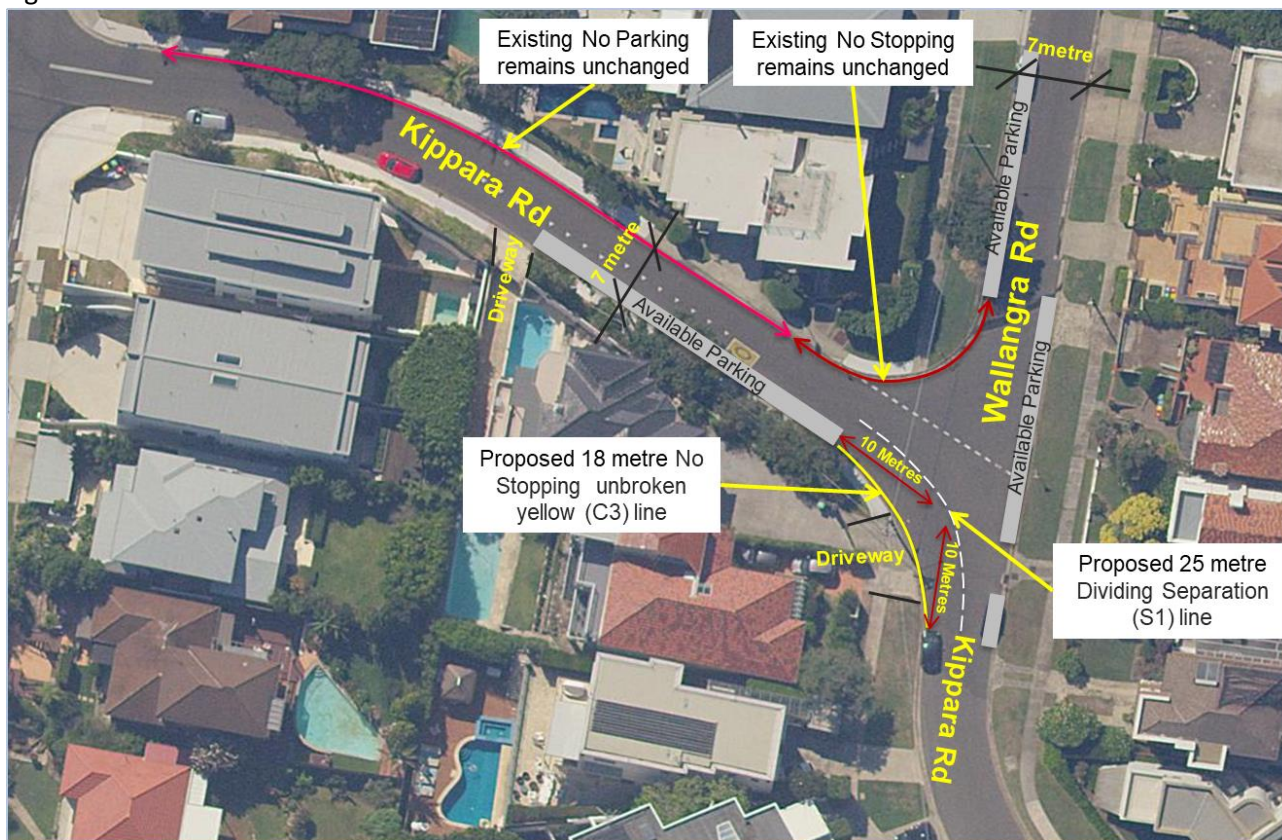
Intersection of Kippara Road and Wallangra Road, Dover Heights.
